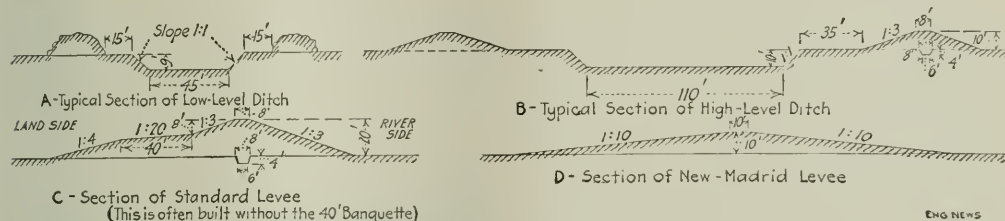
PROPOSED DITCH AND LEVEE CROSS-SECTIONS
